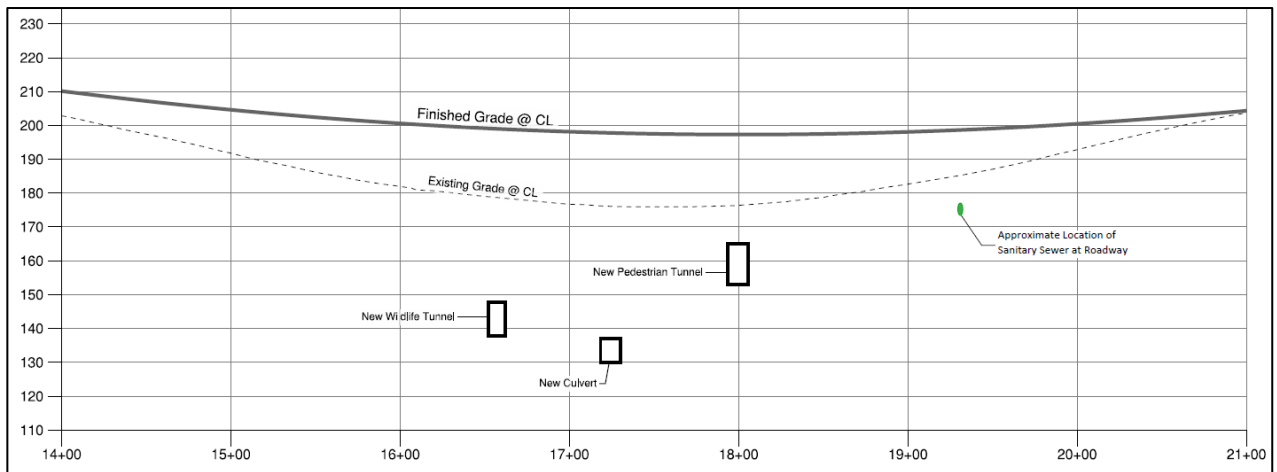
profile of the road and approximate locations of the culvert and tunnels
